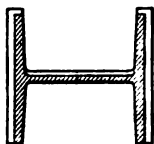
Section of Bethlehem H Column Showing Variation in Area
